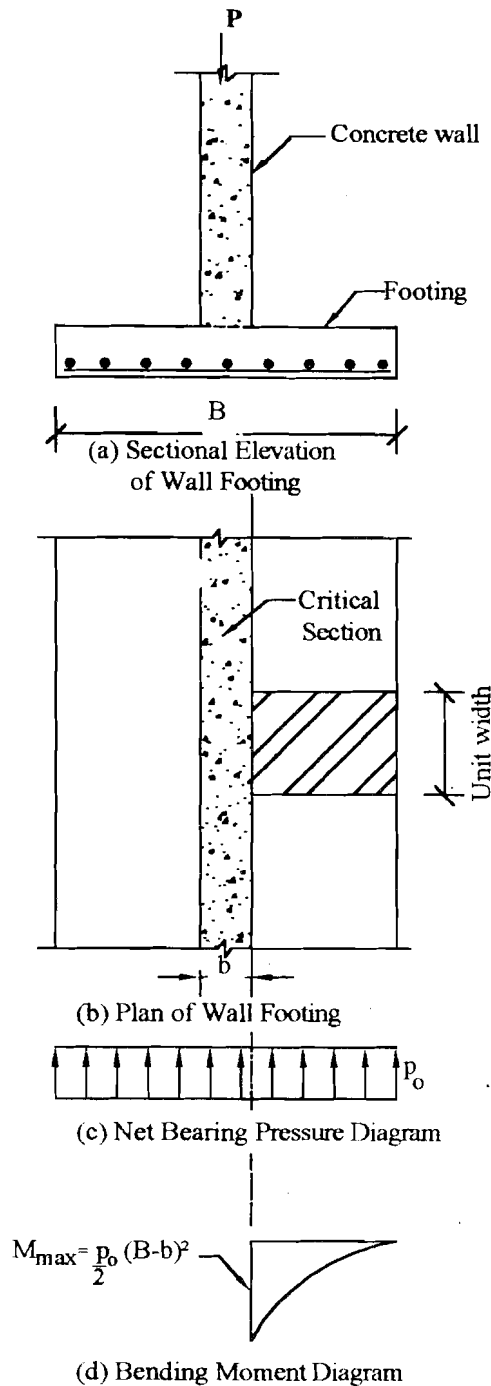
Design B. M. for a Footing of Concrete Wall
